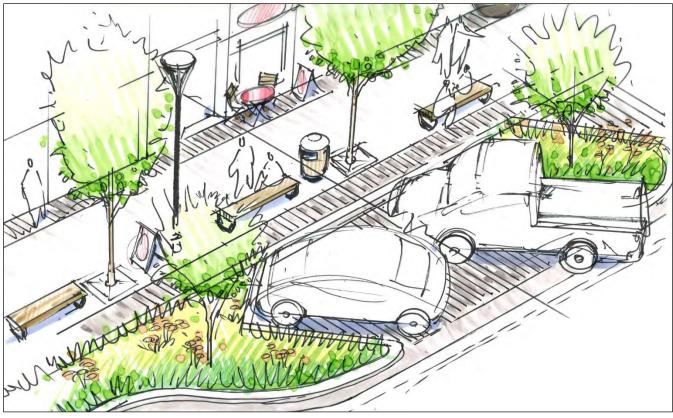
Concept Rendering: Wide Sidewalks with Boulevards and Parking Pockets
